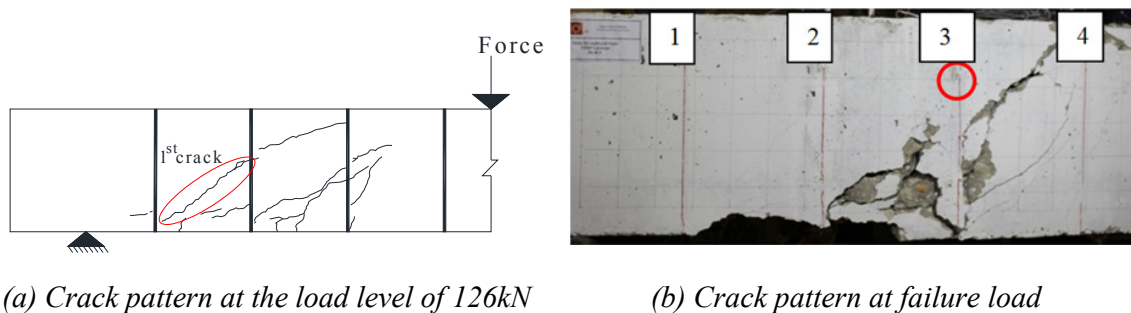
Crack patterns and failure modes of the C-R-I beam
